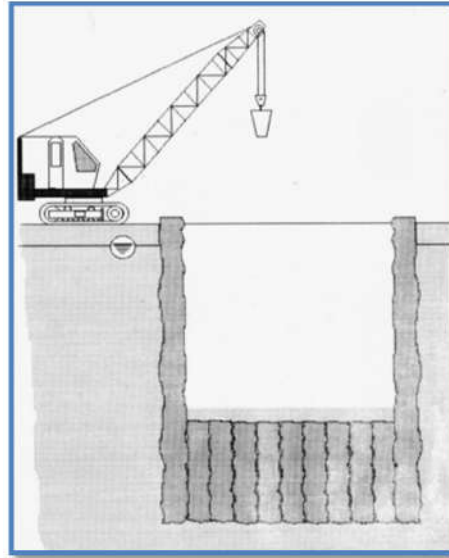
Application of Jet Grouting for Consolidation and Waterproofing
